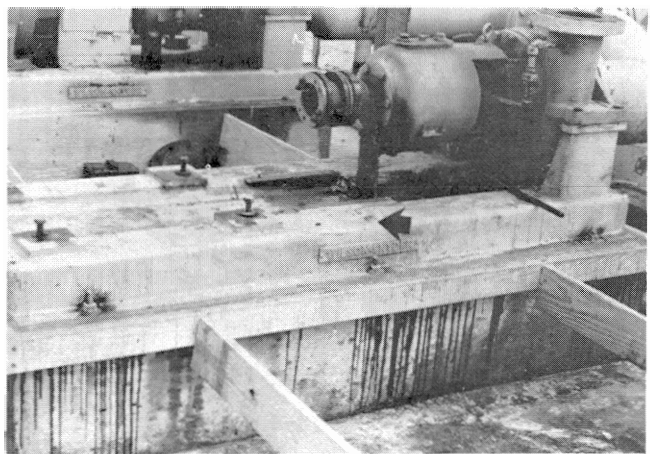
A Typical Stamped Metal Base Under a Centrifugal Pump which has been Grouted and is to be Pressure-Grouted thereby Filling All Remaining Voids.
